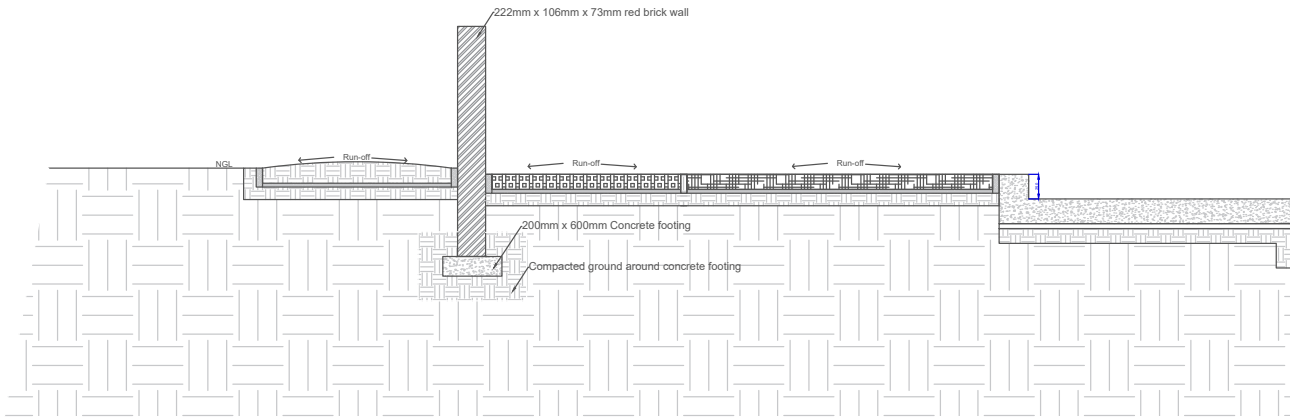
Section A-A - Plan view of off stream filtration system (Author, 2018)
